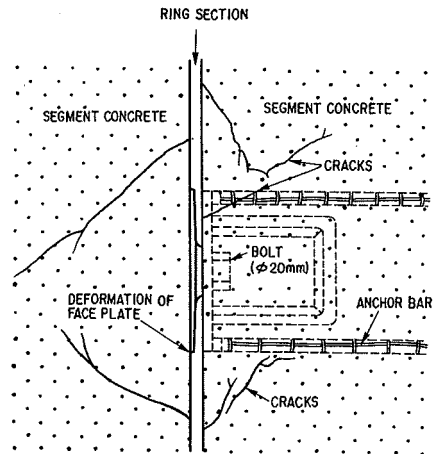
Failure Mode of Ring Joint (E-type Specimen)
